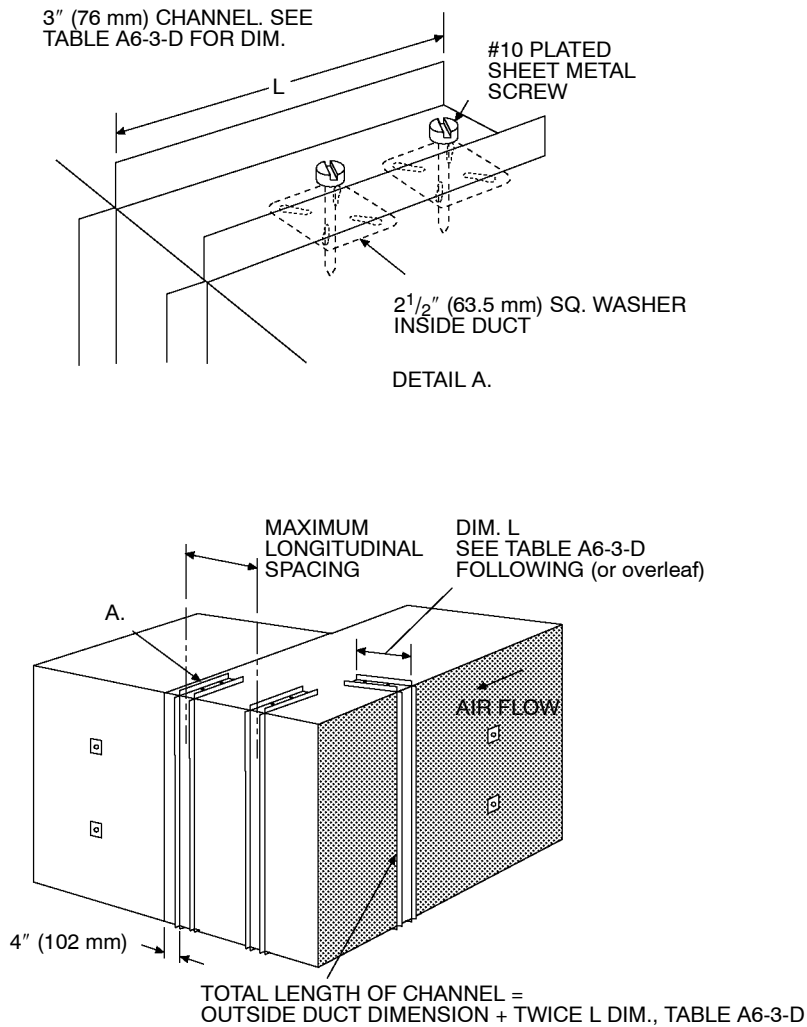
PARTIAL WRAP-AROUND REINFORCEMENT
